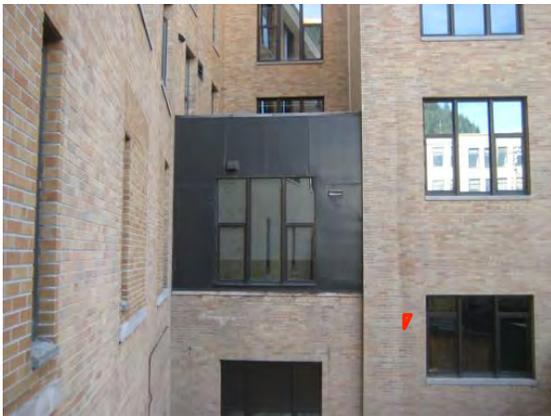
(1): N-Facing, Metal-Clad Wall
